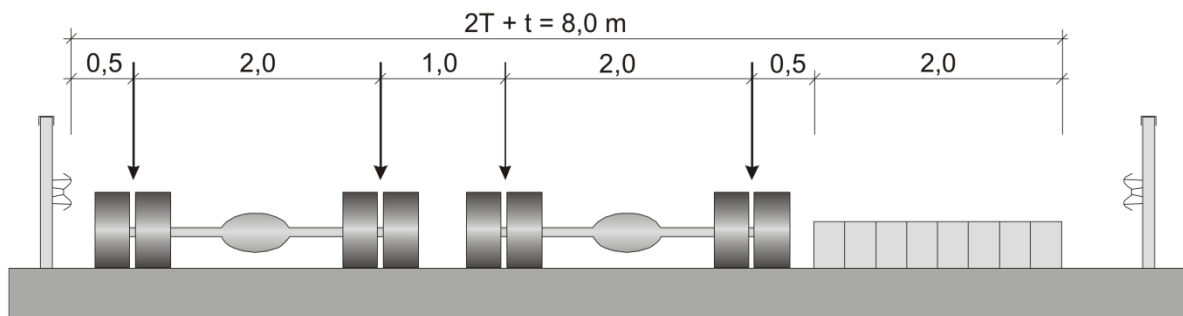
Locations of the loads in the cross section of the bridge, *Håndbok 238 bruklassifisering.
